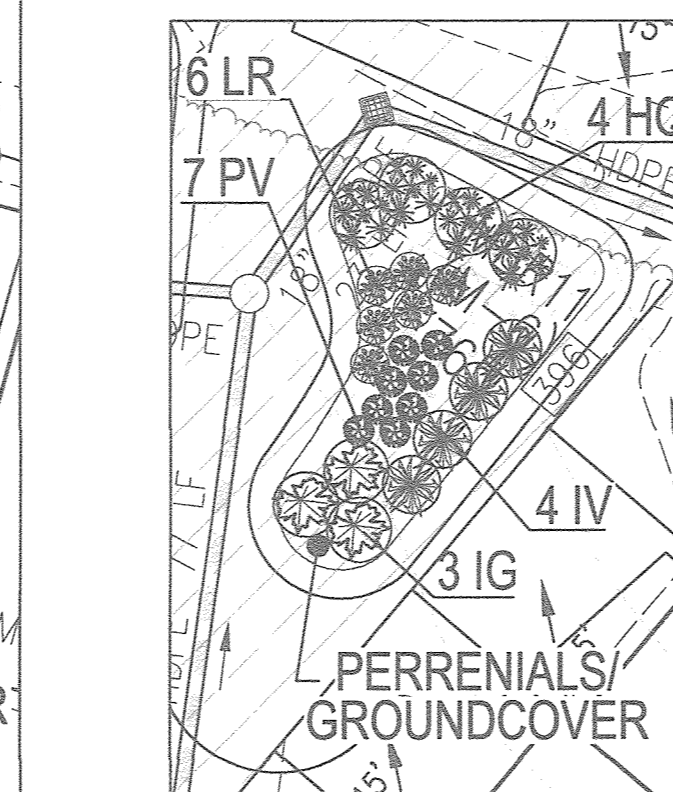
DETAILED BIO AND PLANTING PLAN (SWM #7)
